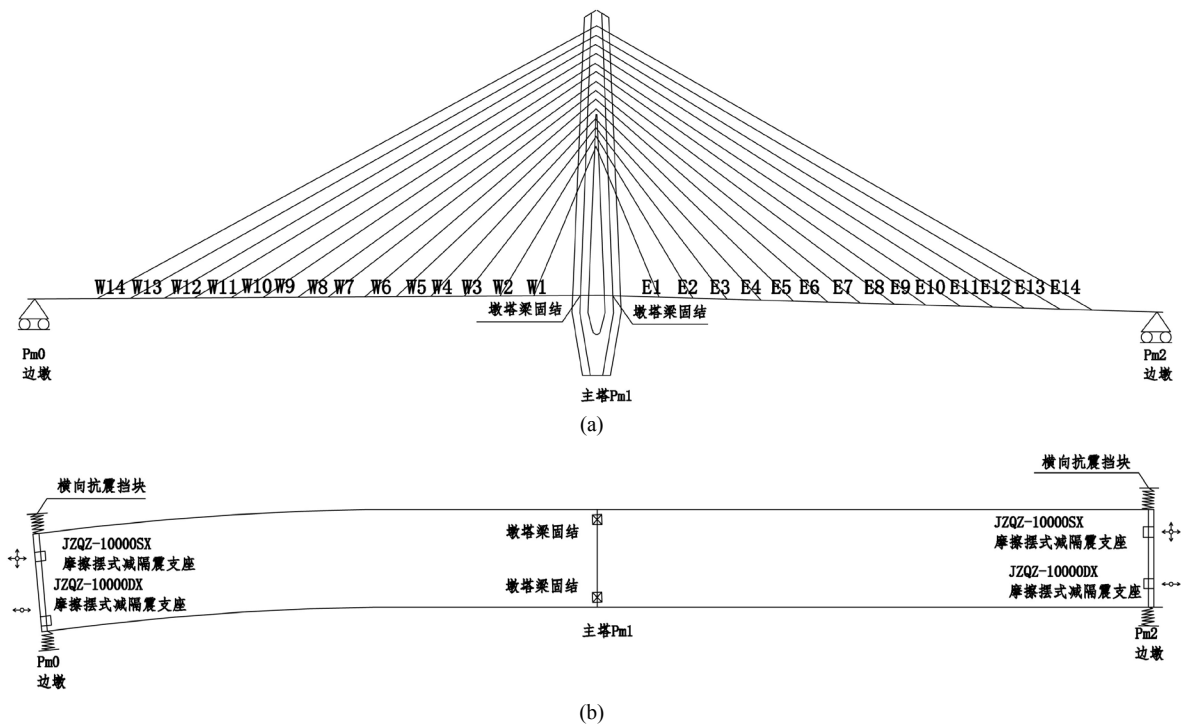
General layout of bridge. (a) Façade layout; (b) Plane layout
